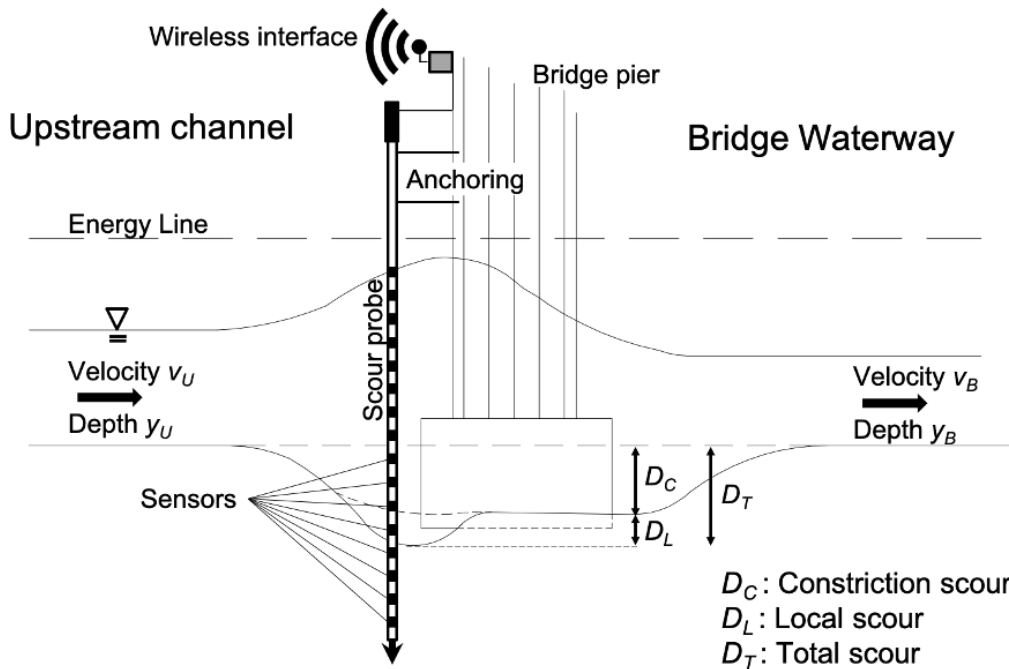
Layout of the pilot scour monitoring system installed at the A76 200 bridge [62].
